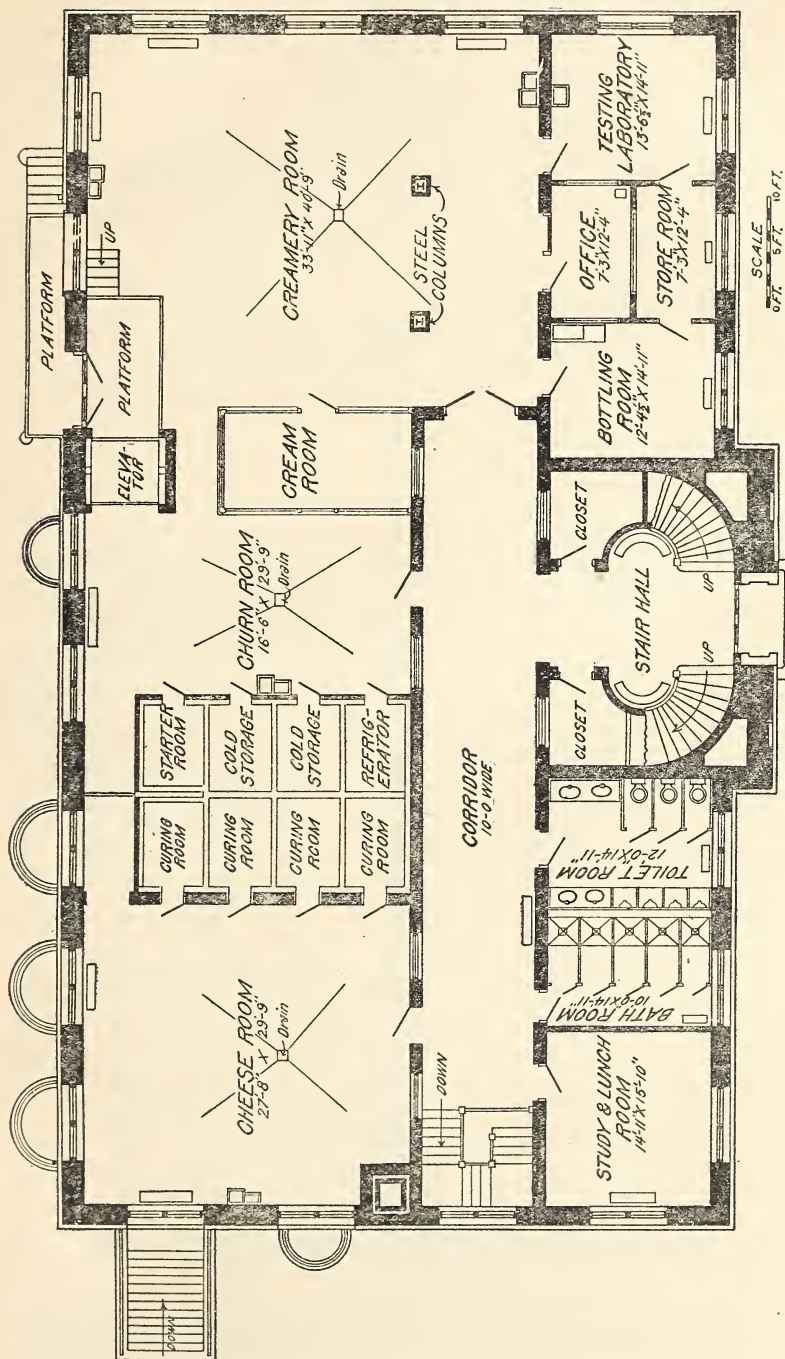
Ground-floor plan of dairy building, Iowa College.
